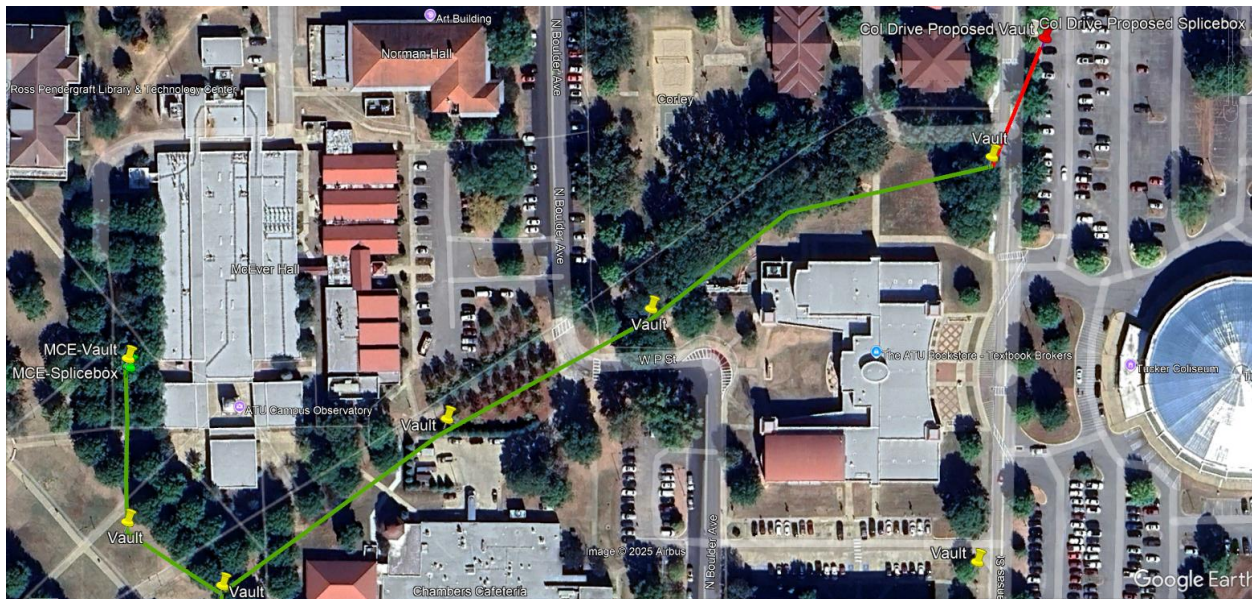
Option B involves a single bore to install a 4" conduit to connect the newly installed ground vault to the Southeast of the ATU Post Office building on Coliseum Drive (part of the required work above) to an existing ground vault directly to the Southwest and across the street. This forms a conduit path to connect the newly installed splice box (also part of the required work above) located there to an existing splice box to the West of the McEver building.
